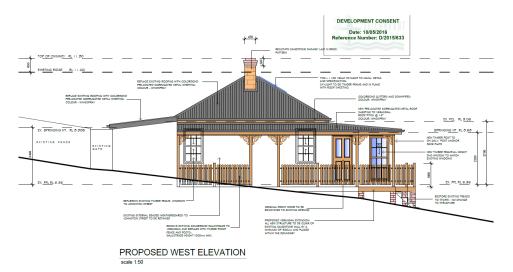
Approved plans for proposed west elevation of 18 Johnston Street. Source: D/2015/633, d'Riva Designs, DA-04A, Proposed West Elevation, Feb 2015.
